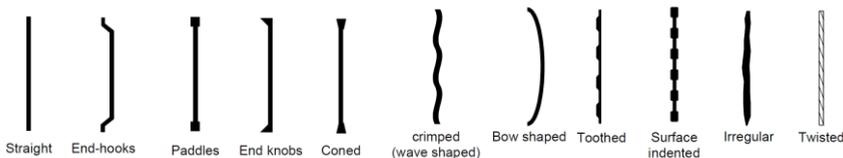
Typical shapes of fibres used for concrete reinforcement [15].
